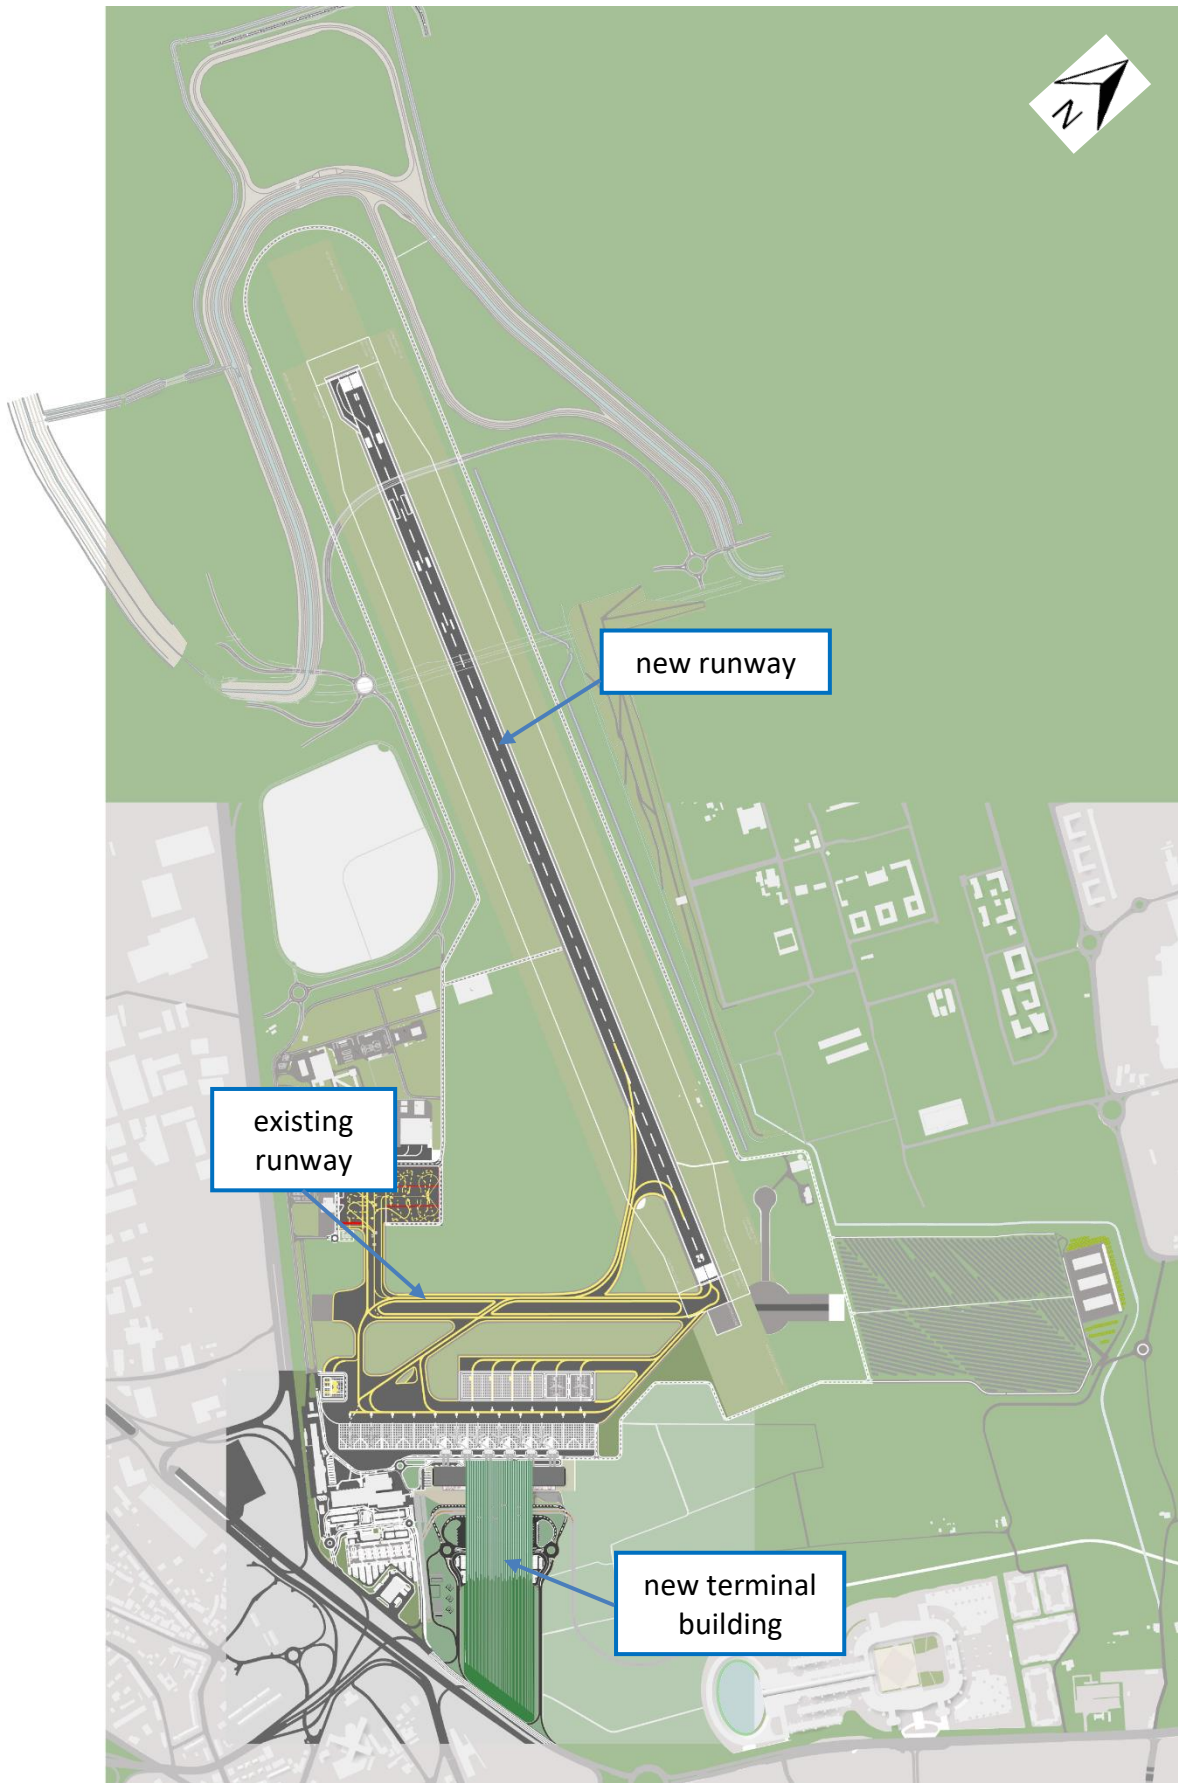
Site plan with planned terminal building and planned new runway (RVA, 2023)
